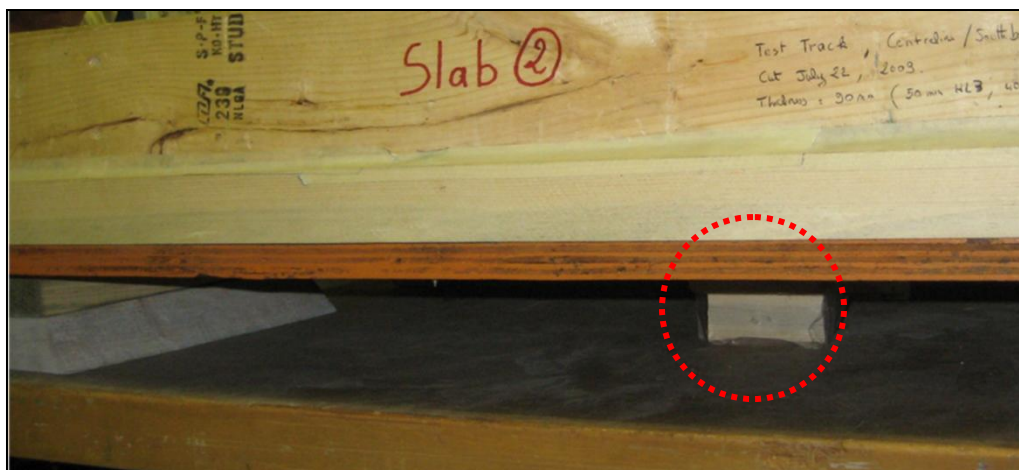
Photo of slab 2 showing a wood support bar between the table and the slab.
